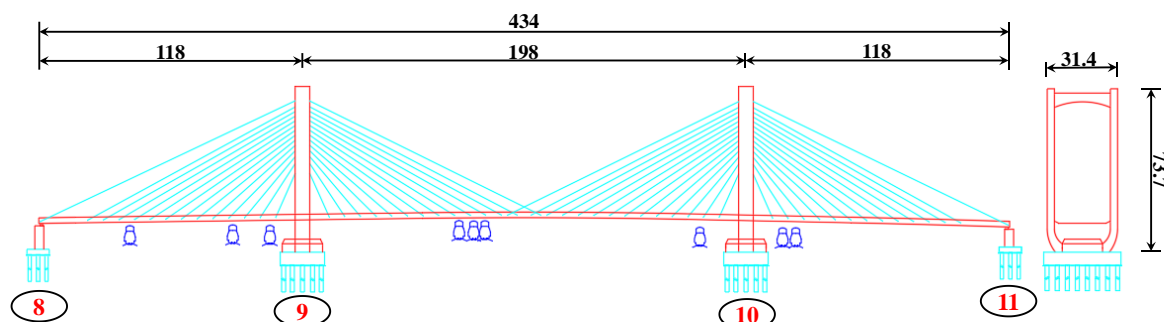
Layout diagram of span of cable-stayed bridge with rotation (m)
